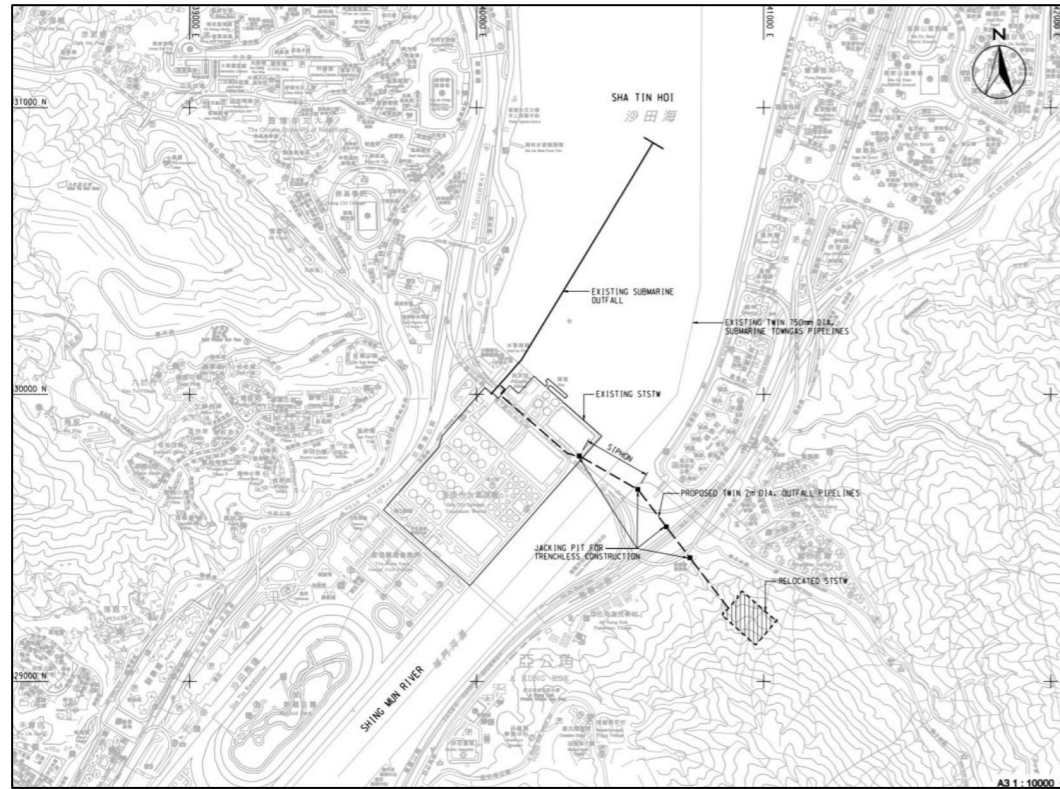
Alignment of the Proposed Emergency Outfall of Relocated STSTW
